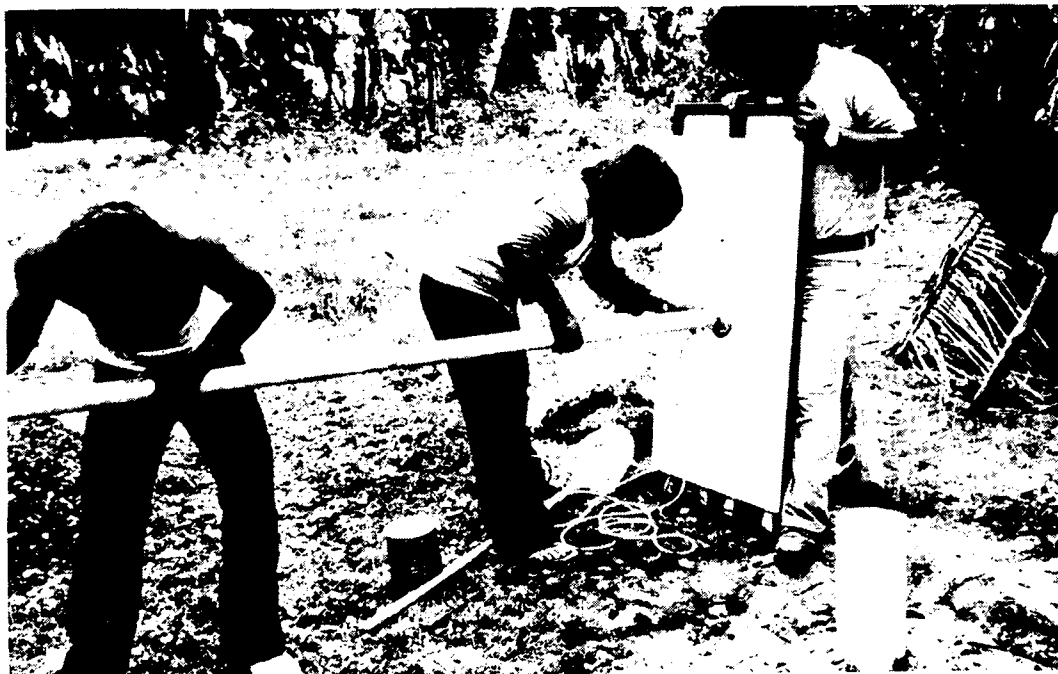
Attaching the galvanized pipe. Screw the 10 foot long piece of 2-inch galvanized pipe into the flange (located on the back of the solar panel assembly) until it is snug.
